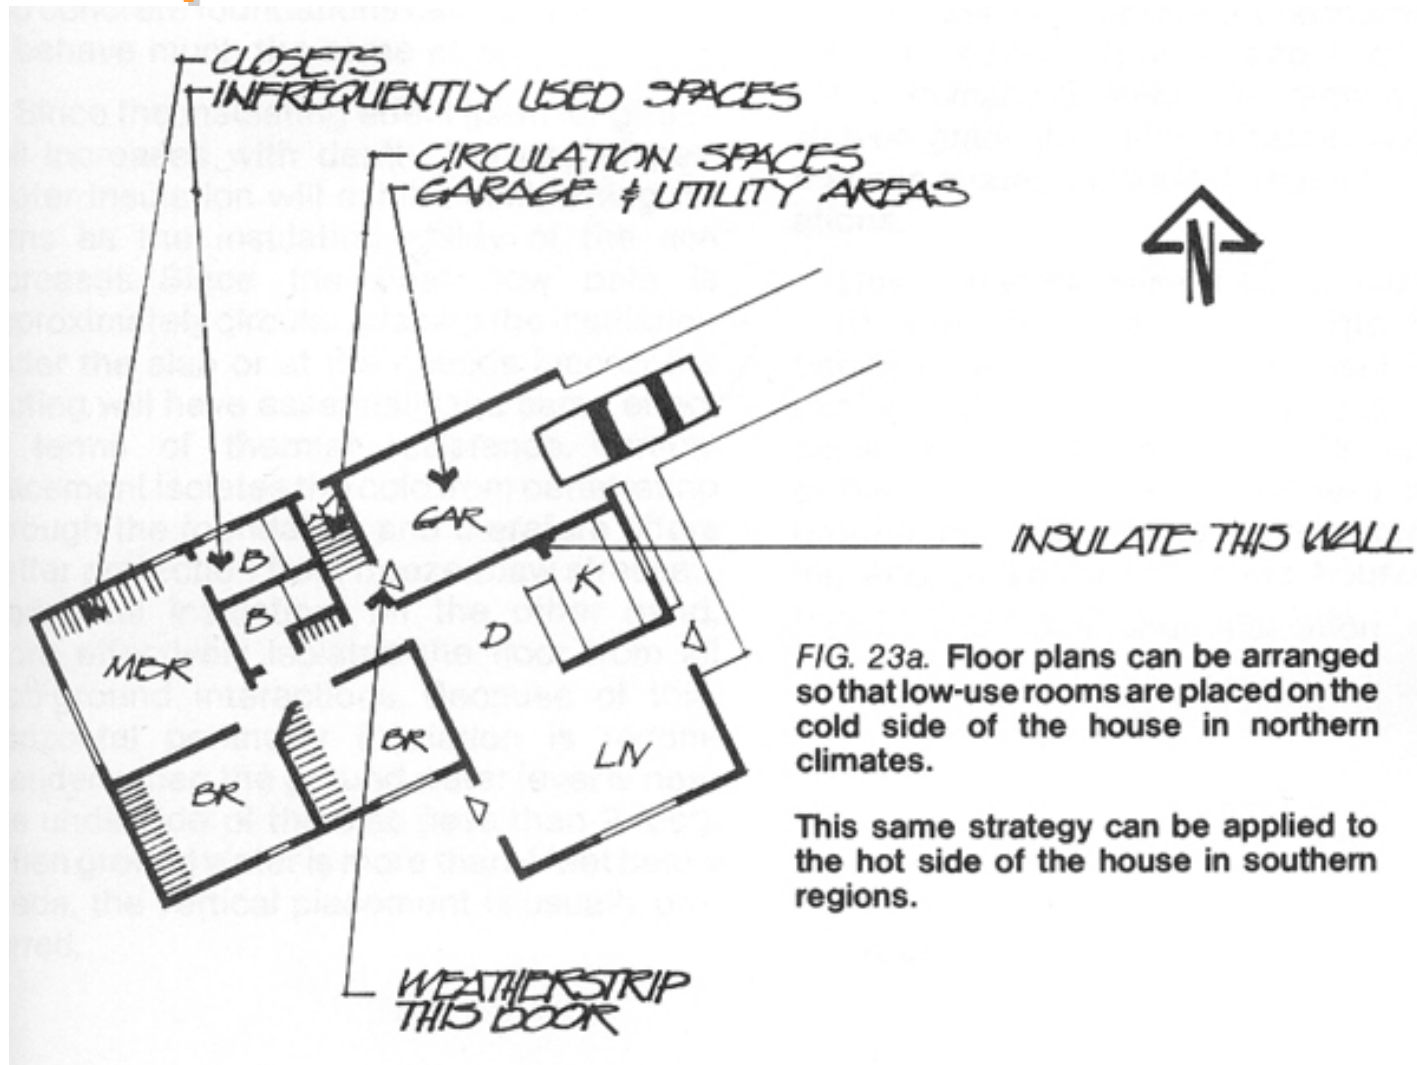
Floor plans can be arranged so that low-use rooms are placed on the cold side of the house in northern climates.
